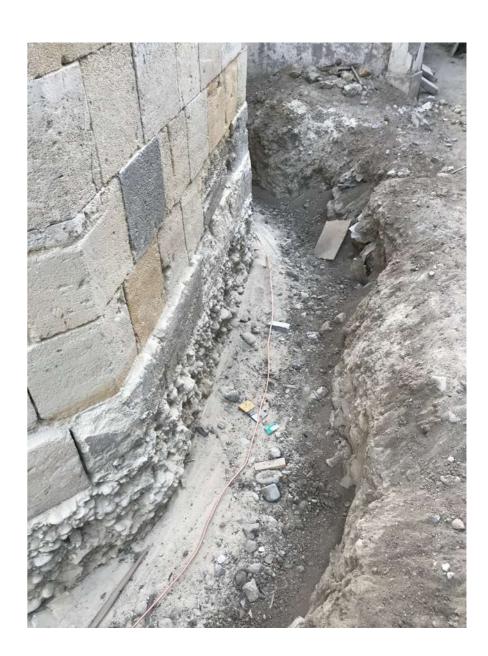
Construction phase pictures and details – Drainage system and insulation installation. © C. Marathovouniotis
